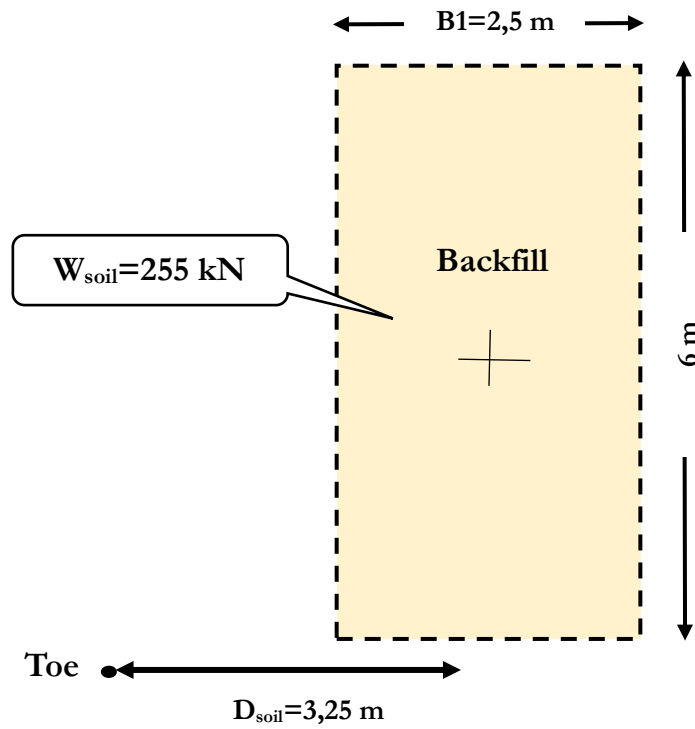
Backfill weight for the Cantilever Retaining Wall.
